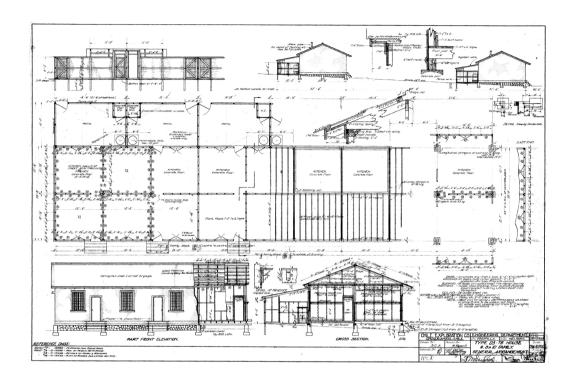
Constructive details of the Company town's houses. Source: ACECCh, May 31, 1924.
